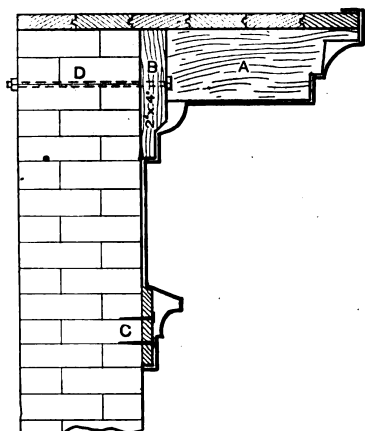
Side Elevation of Wooden Lookout Secured to Wall.
